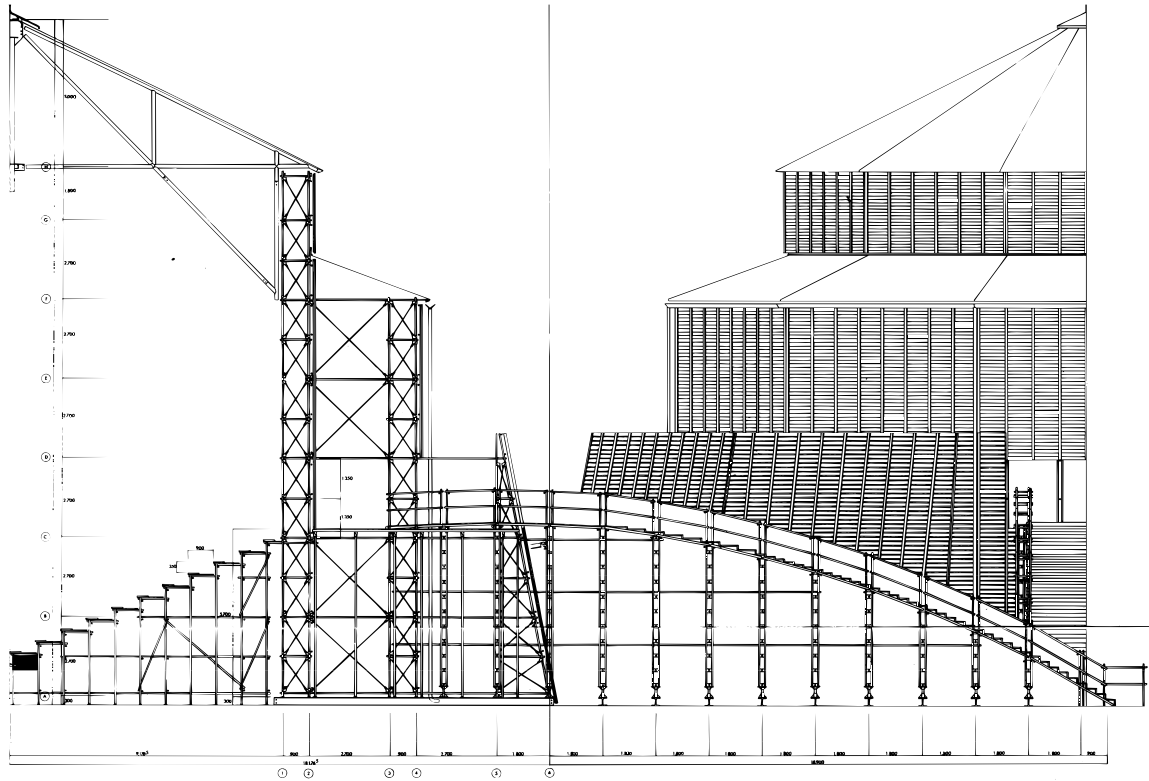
Section and part elevation. The main structure is made from standard scaffolding. The roof utilises a lightweight transportable steel structure.
